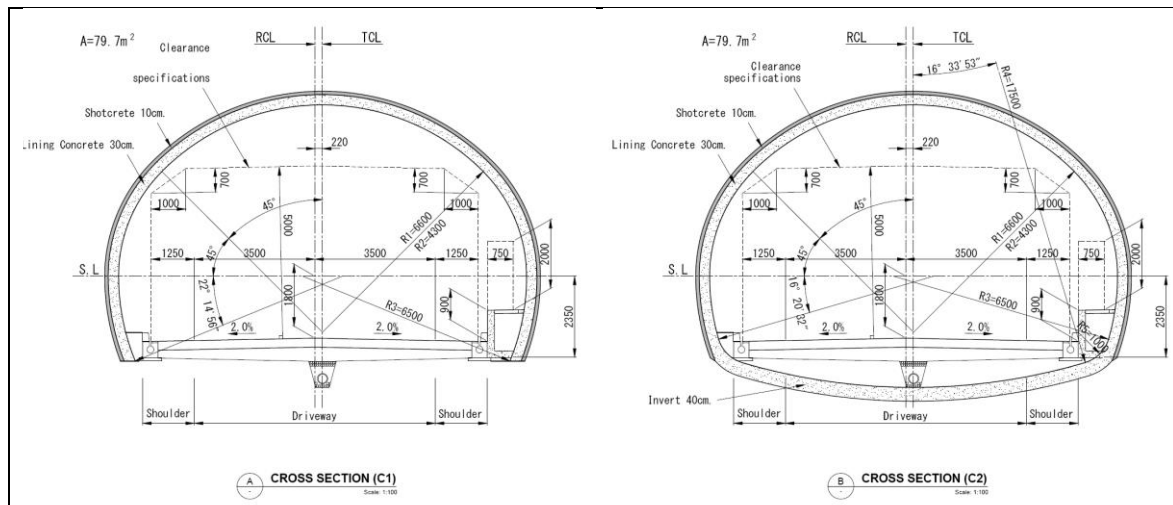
TYPICAL TUNNEL CROSS SECTION (TYPE C)
